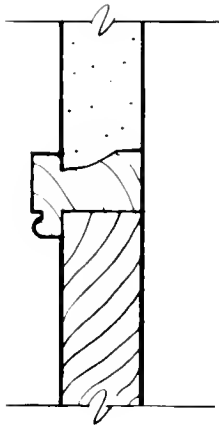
Wall Section This section indicates how the small chair rail is profiled to receive the plaster walls on top and the wainscoting on the bottom.
